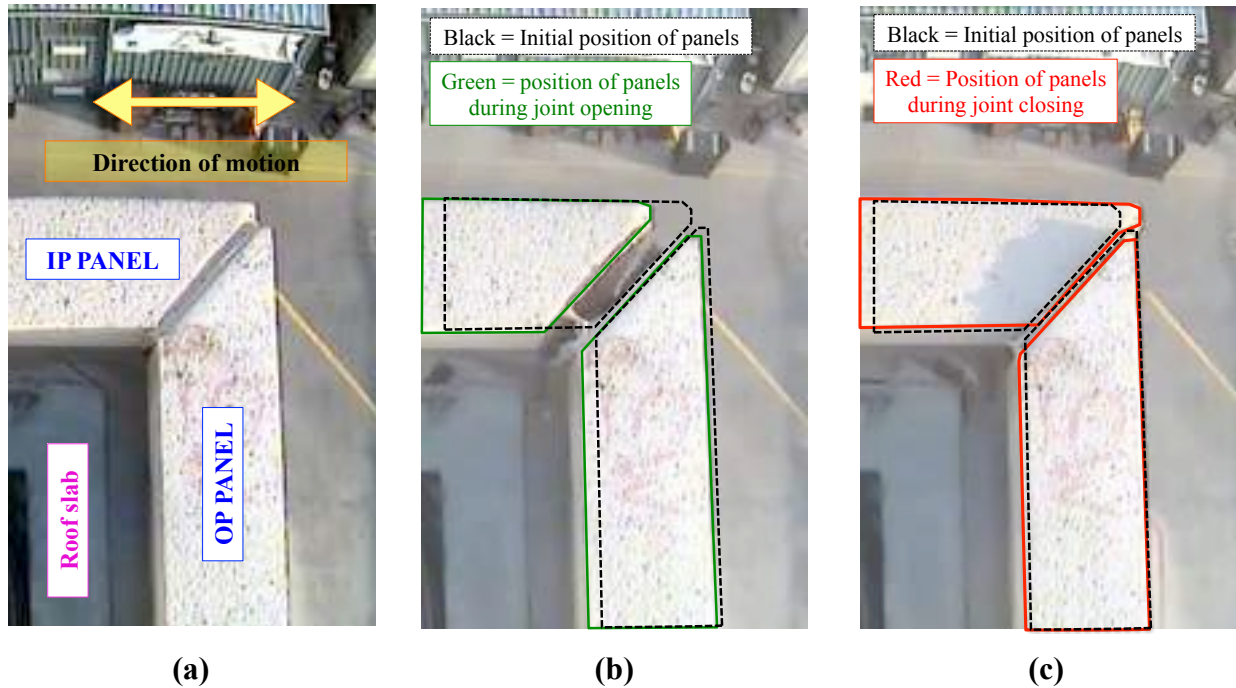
Screenshots from videos of the corner joints view from the roof (view looking down) during FB-6 for the miter joint in the SW corner showing (a) original position, (b) joint opening and (c) joint closing
